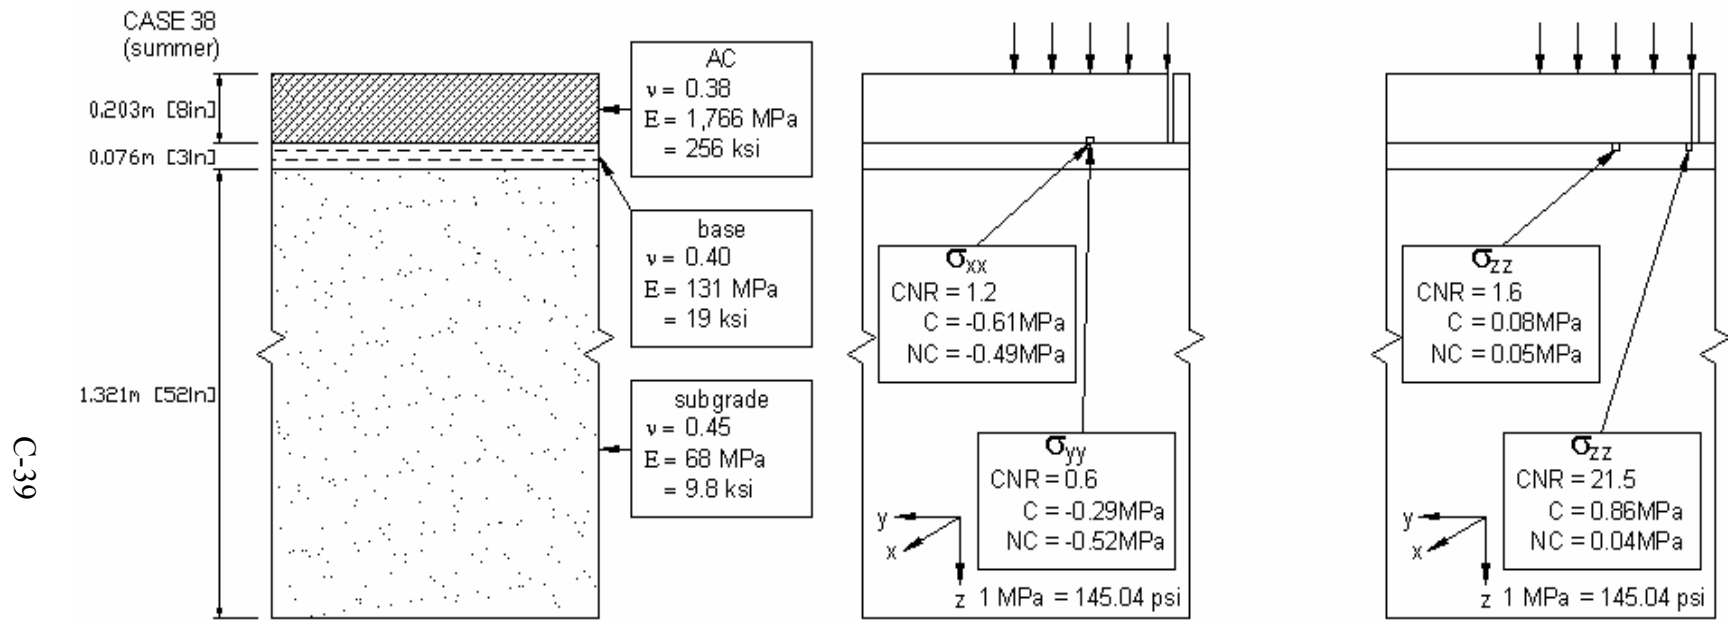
Summary cross section for case 38, (C – stress in cracked pavement, NC – stress in pavement with no crack, CNR – crack/no crack (stress) ratio)
